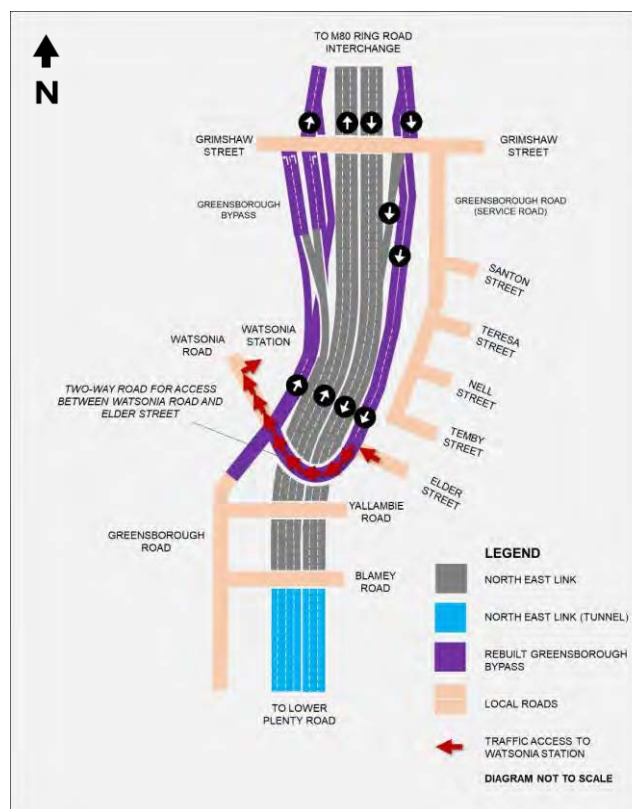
Watsonia railway station access for existing road network, from Elder Street
